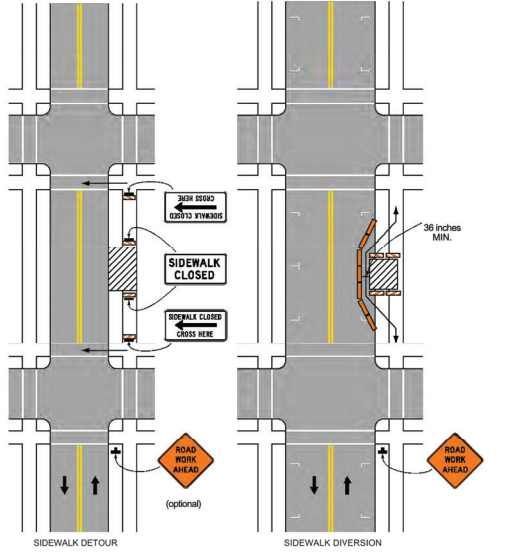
H-28. Sidewalk Detour or Diversion (TA-28)
